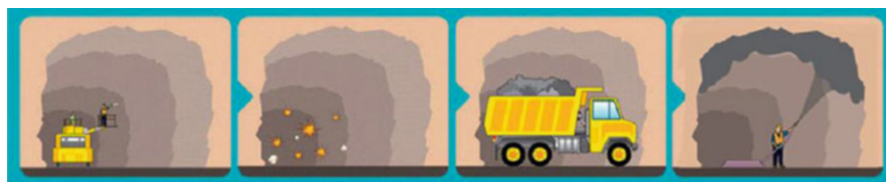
Construction sequence of drill and blast technique (Ref: <http://www.mtr-kwuntonglineextension.hk/en/construction/construction-methods.html>)
